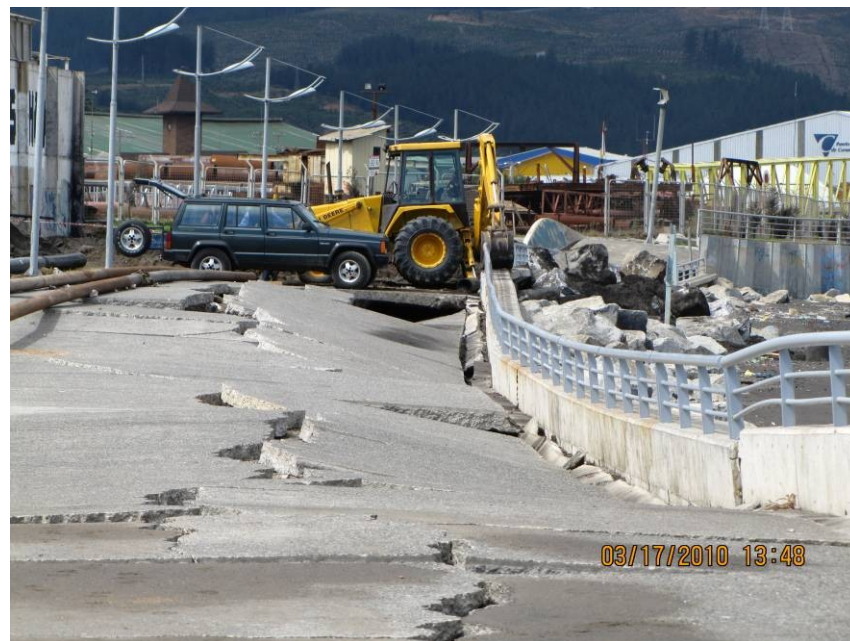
Photograph of lateral spreading which destroyed pavement and cracked walls at the fishermen's Port of Coronel ($S37.0247^\circ$, $W73.1550^\circ$; 1348 hrs, 03/17/2010).
